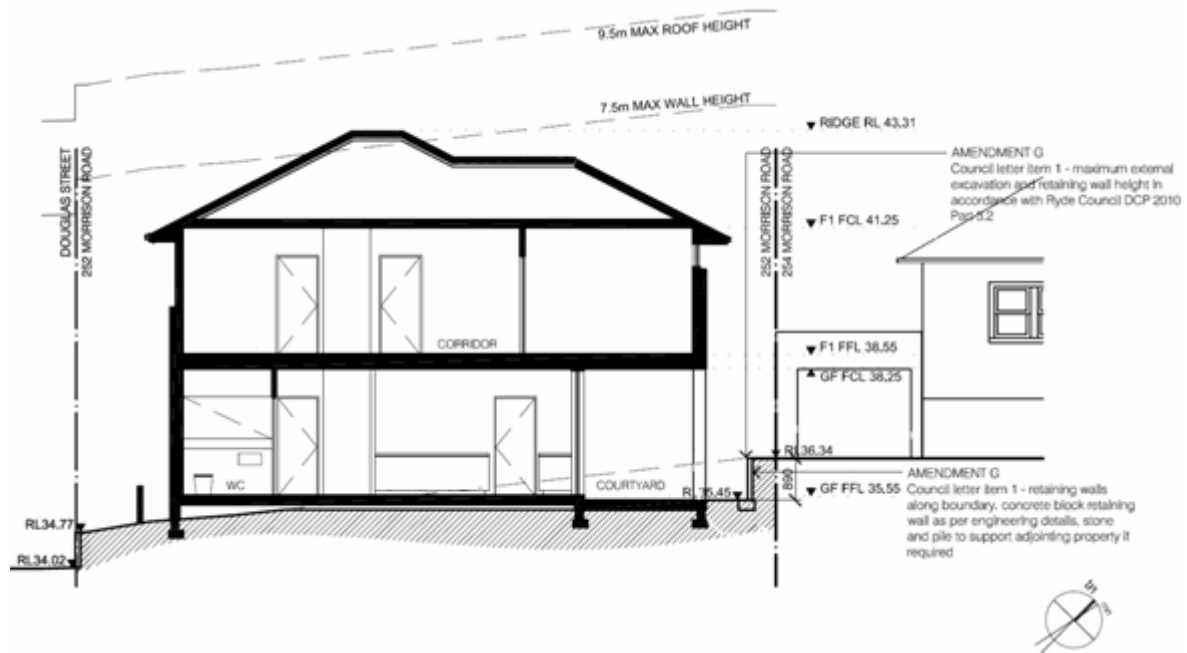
Cross-section of the proposed development showing amount of cut at the boundary.
